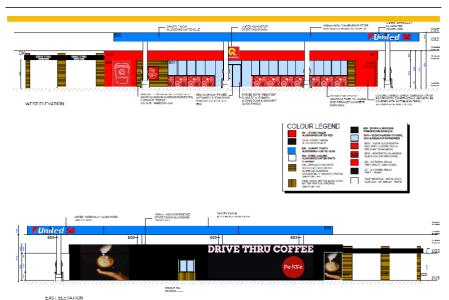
ELEVATIONS (EAST AND WEST) PREPARED BY SHA PREMIERE CONSTRUCTION
